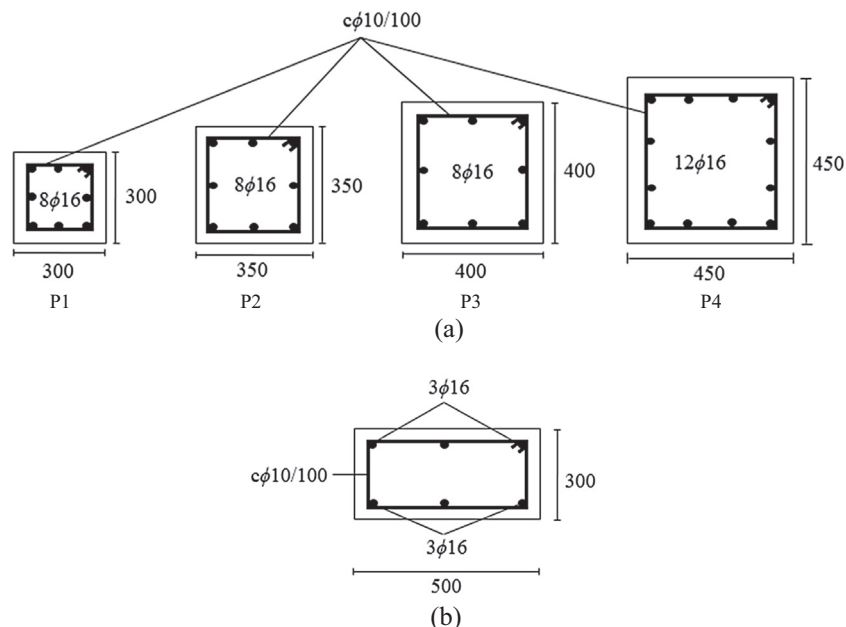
Cross-sections for elements in 5- and 8-storey frames. (a) Columns. (b) Beams. [Dimensions in mm].
